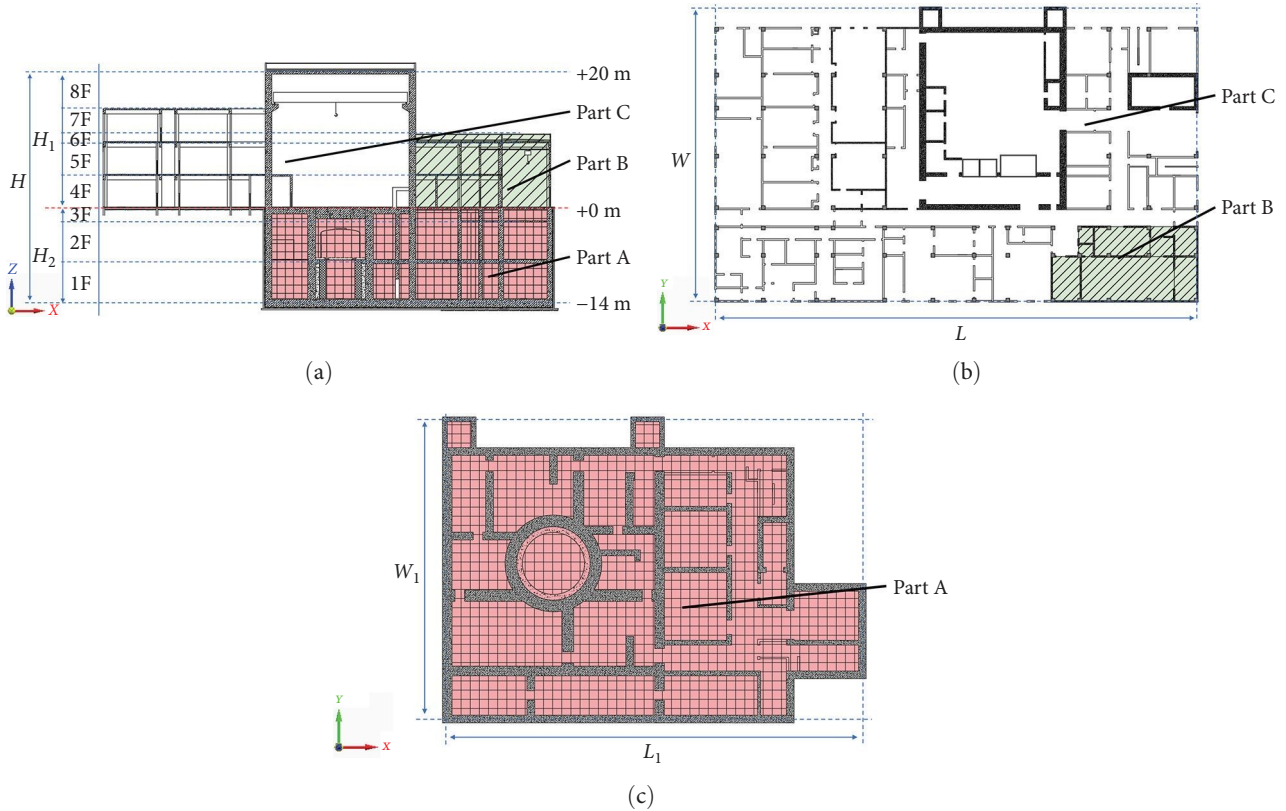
The sketch and zoning of TMSR-LF1 structure: (a) elevation view; (b) +0 m floor plan; (c) -14 m floor plan.
